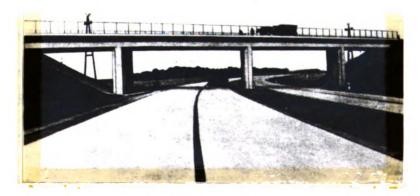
Bridge Over Breslau-Kreibau Autobahn
